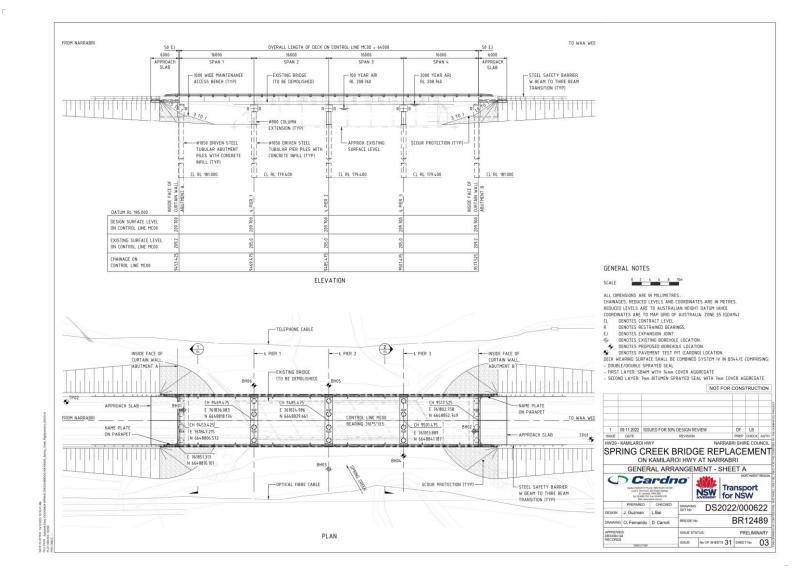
Long section of the new bridge (Transport 50% Detailed Design)
